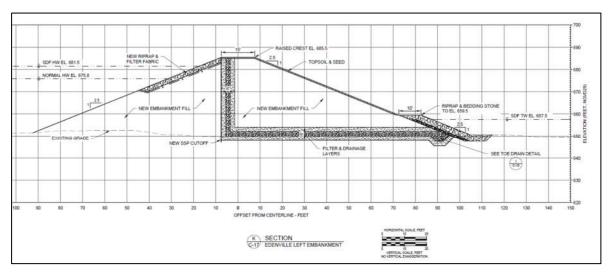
Cross Section View Edenville Dam Left Embankment Reconstruction
